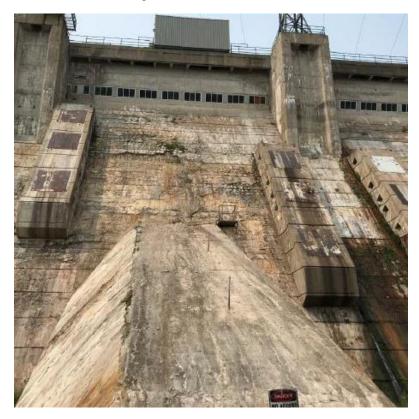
Example of concrete repairs required at the water intake downstream face
